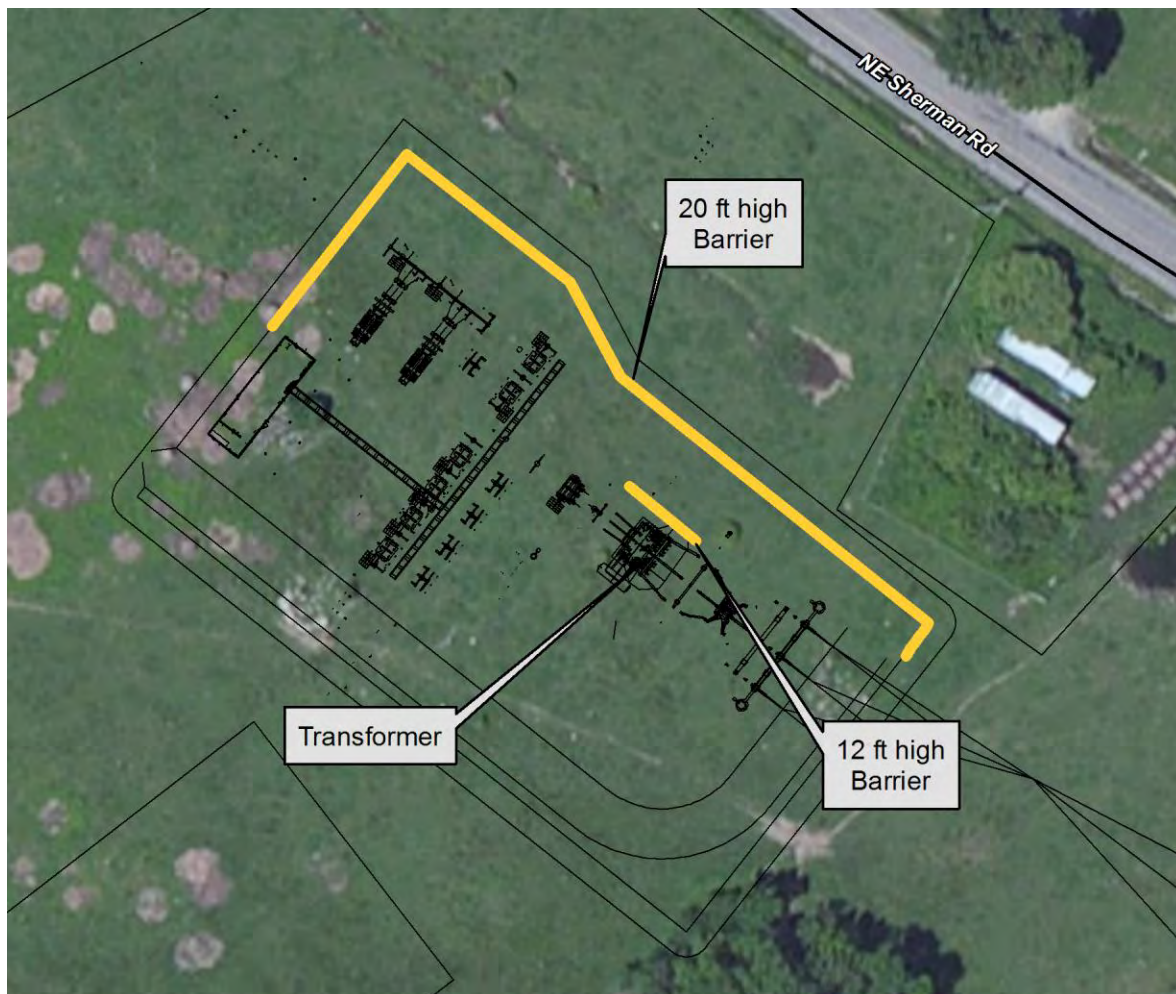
PROPOSED SUBSTATION NOISE BARRIERS
